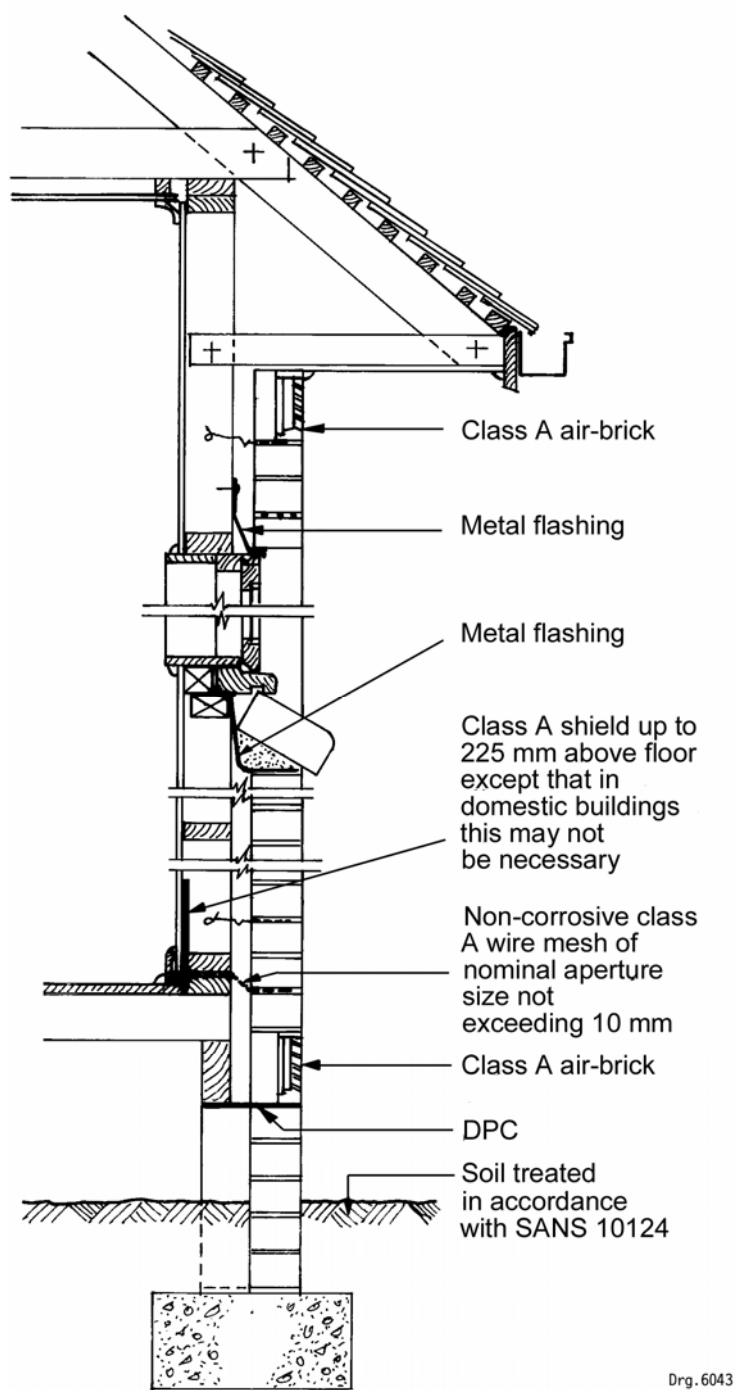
Rodentproofing of sheeted walls in commercial buildings
